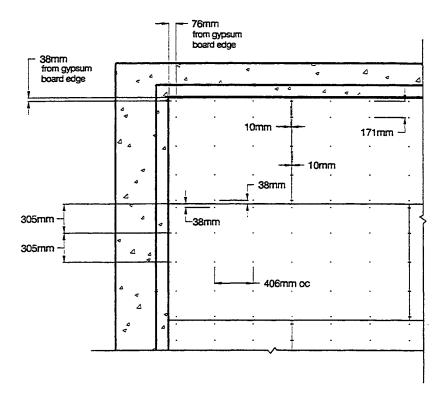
Screw pattern for face layer gypsum board layout, resilient metal channels 406 mm o.c.
